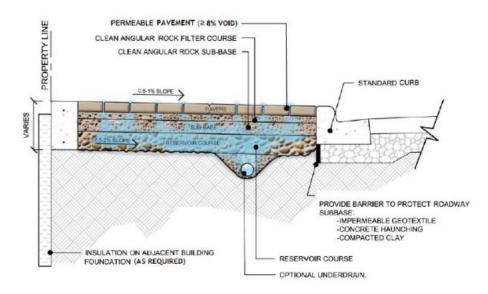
Cross Section of Permeable Pavement (Drainage Services, City of Edmonton -Low Impact Development: Best Management Practices Design Guide, https://www.edmonton.ca/city_government/documents/PDF/LIDGuide.pdf))
